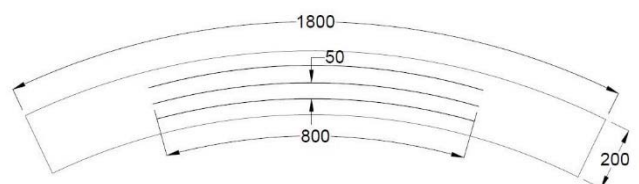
Schematic diagram of the arrangement of Grooves (Plan view – bottom surface)
